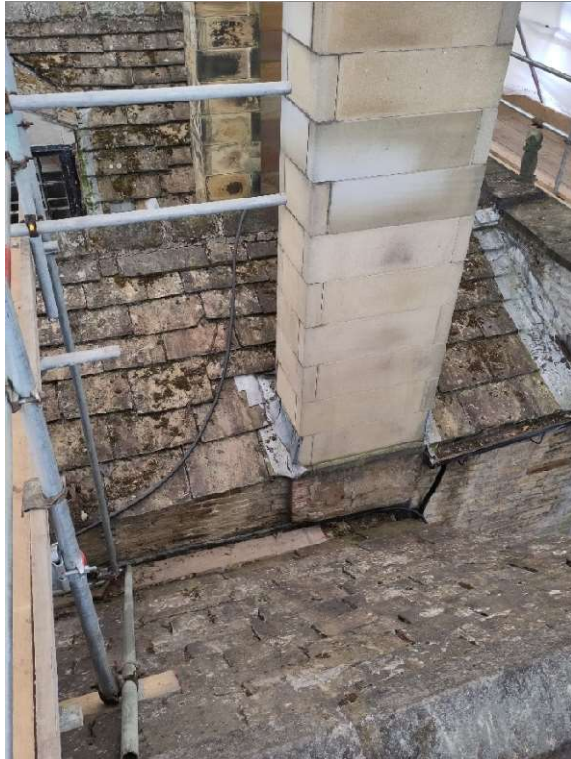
Stack S4, from East, base section – Note rendered brick corbelling at base
